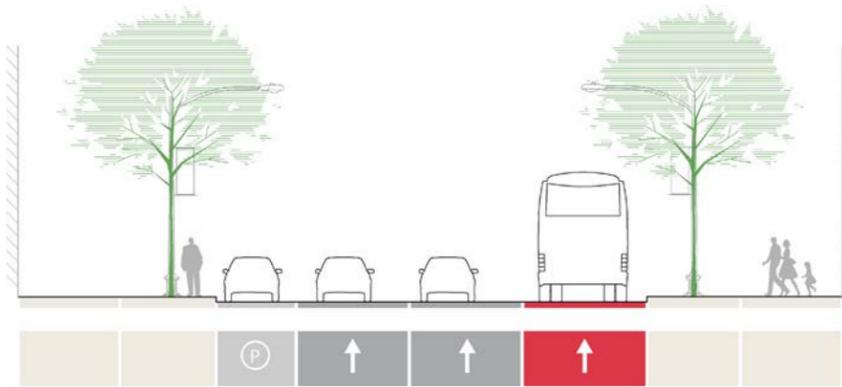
Seventh Street typical section San Jacinto Boulevard to Guadalupe Street
